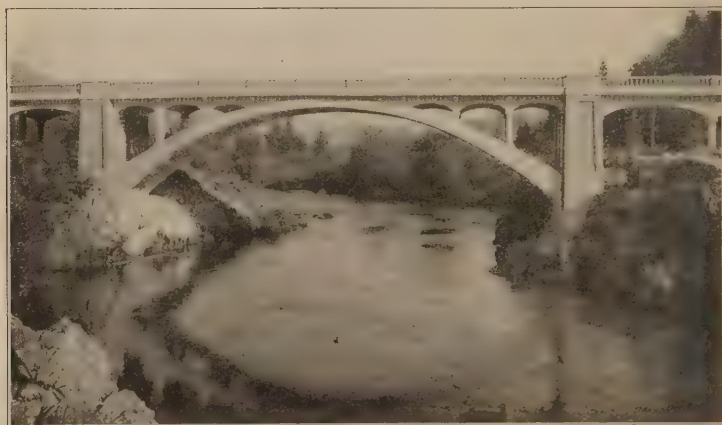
Arch span (open spandrel type) with abutment costs reduced, owing to the presence of steep, rocky river banks.
